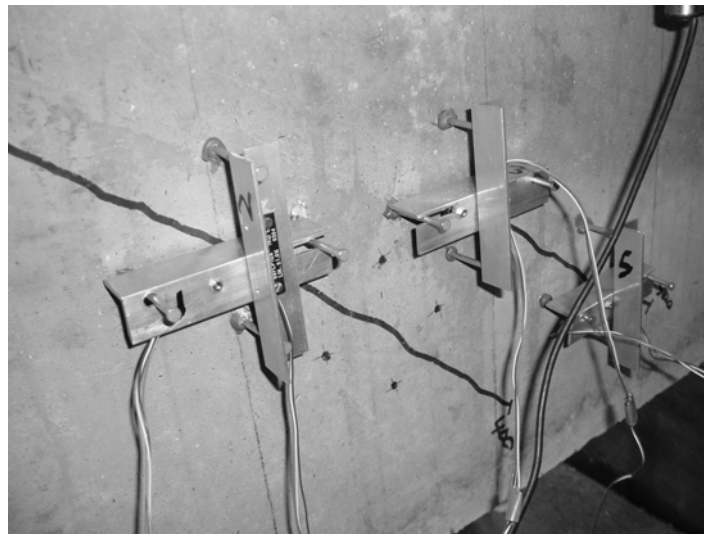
Cross of LVTDs placed after pre-cracking the beam (South Side, BG1)
